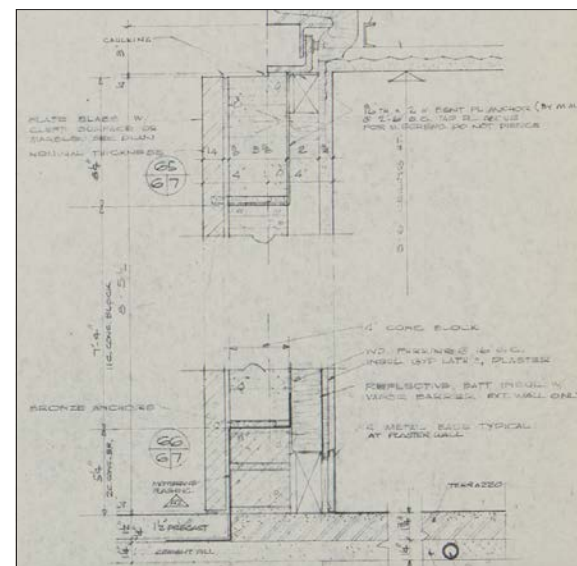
Details at corner and base of exterior walls, showing the slate and interior plaster wall installation. Note that the exterior terrazzo was originally indicated as precast concrete. Date: February 18, 1955. Photo credit: Miller House and Garden Collection (M003), Newfields Archives
